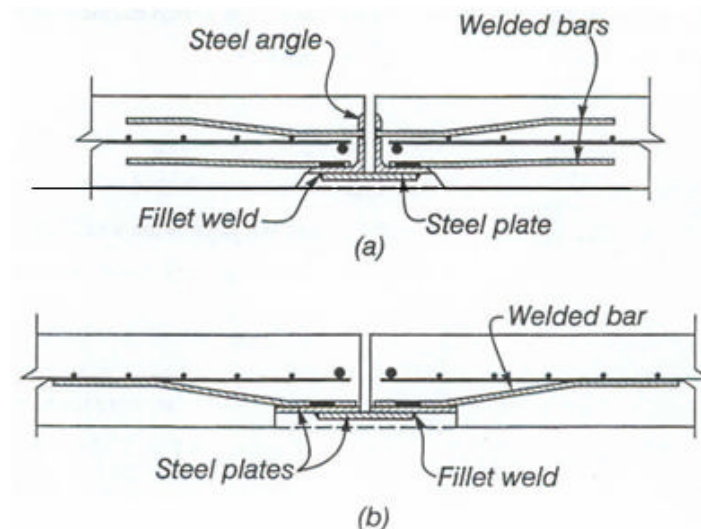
Typical welded connections for joining wall panels (Restrepo *et al.*, 1996)
